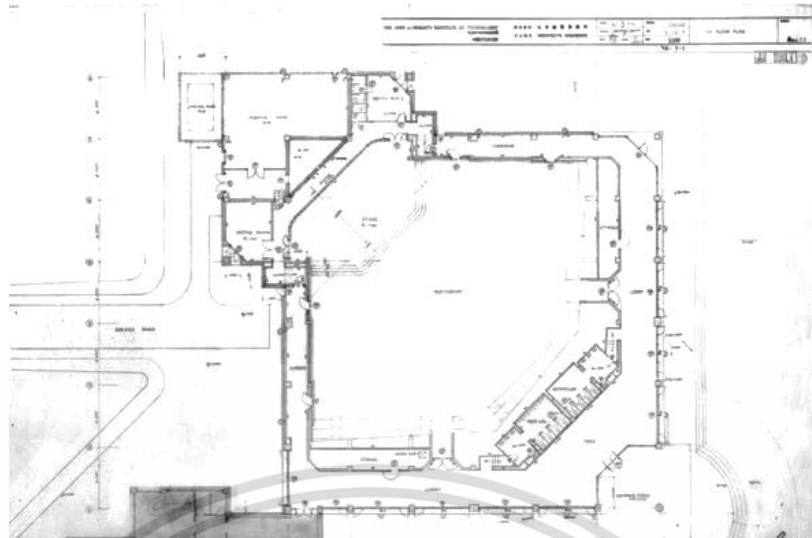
Original drawing of auditorium (First Layout Plan)
